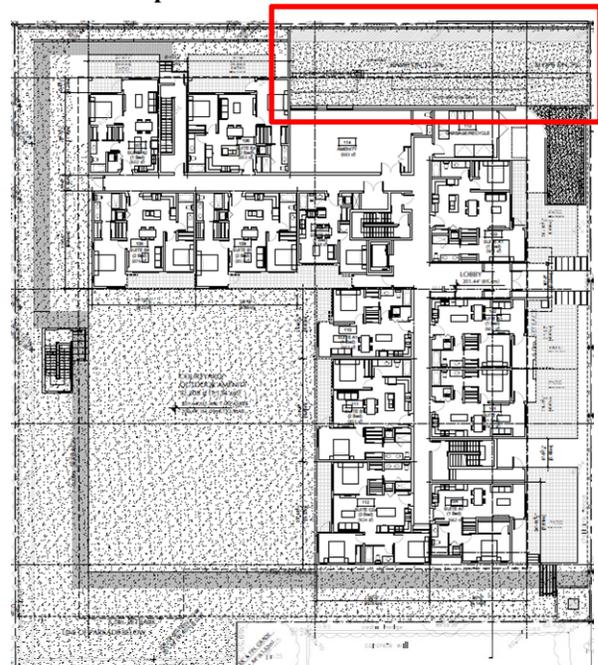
Revised access to the parkade from the southeast to northeast corner of the subject site
